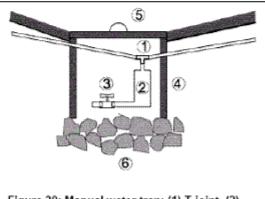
Manual water trap: (1) T-joint, (2) buffer storage for condensated water, (3) manual tap, (4) casing, (5) concrete lid, (6) drainage Source: TBW
